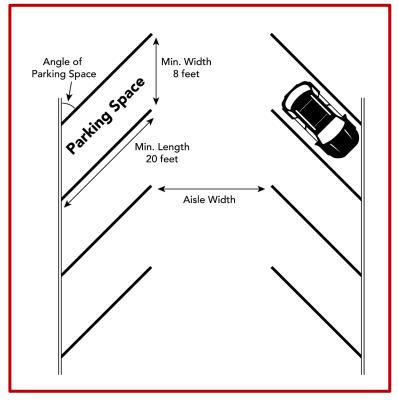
Parking Stall and Aisle Way Dimensions, Angled
